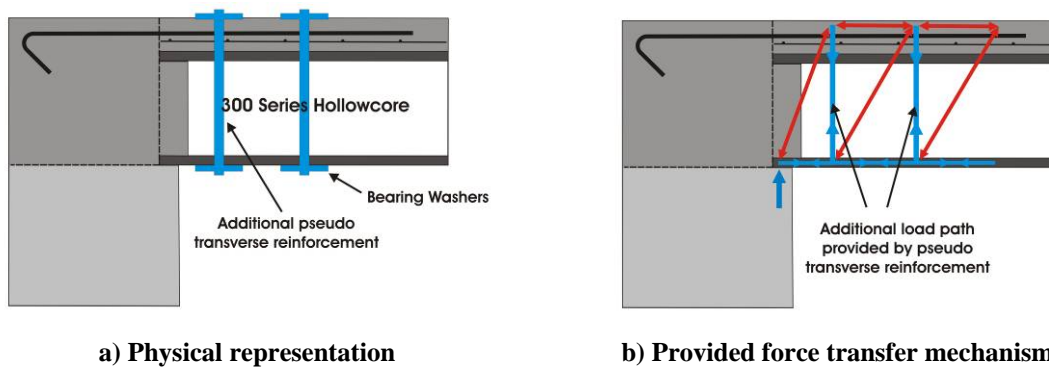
Pseudo transverse reinforcement retrofit concept
